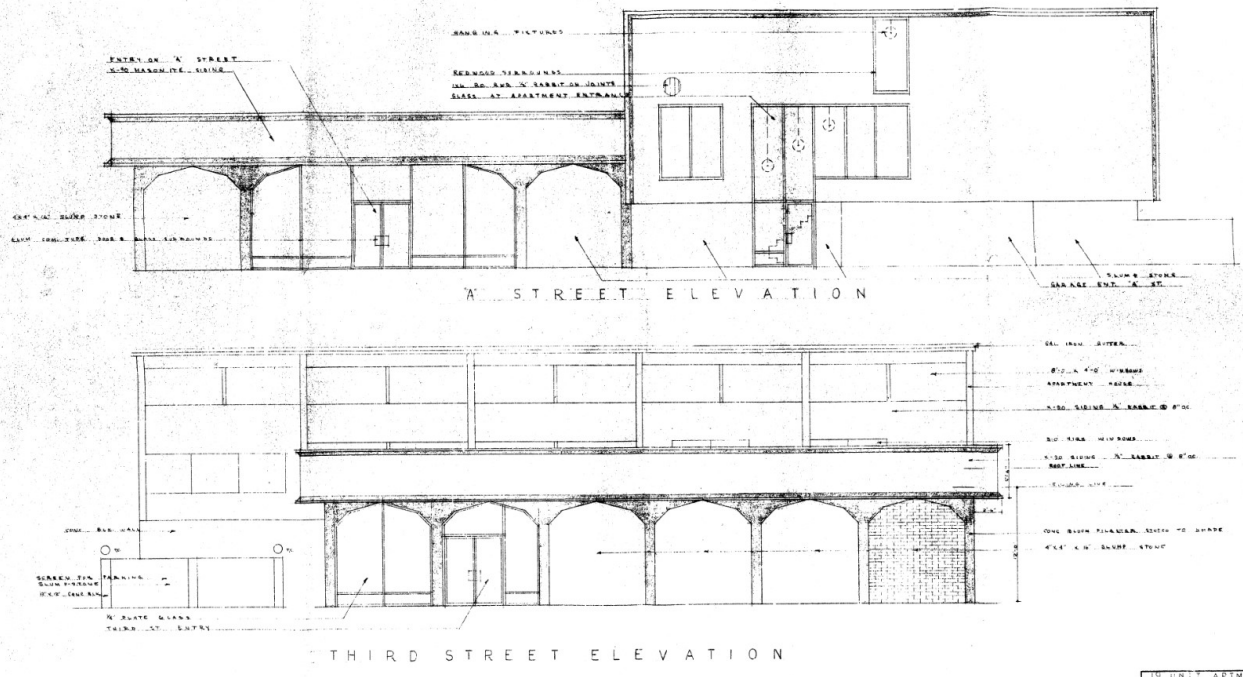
City of Davis, Elevations of 230 A Street, 1966.
